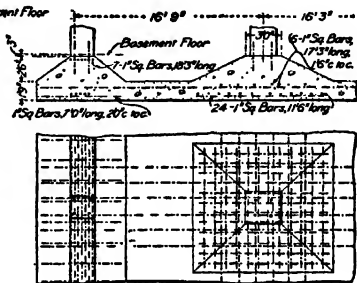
d* represents a novel type of foundation used for a loft building in New York City. There were three lines of columns, two lines of wall columns and one line, through the center. The foundation presented something of a problem because the adjoining structure rested on a pile foundation, which the architect feared was in a poor condition. On account of the desire not to be forced to the expense of underpinning this adjoining building, a deep foundation was out of the question. The simple spread footing could not be used for the wall columns because of lack of space. As finally constructed, the foundation consisted of a solid framework of reinforced-concrete beams.
